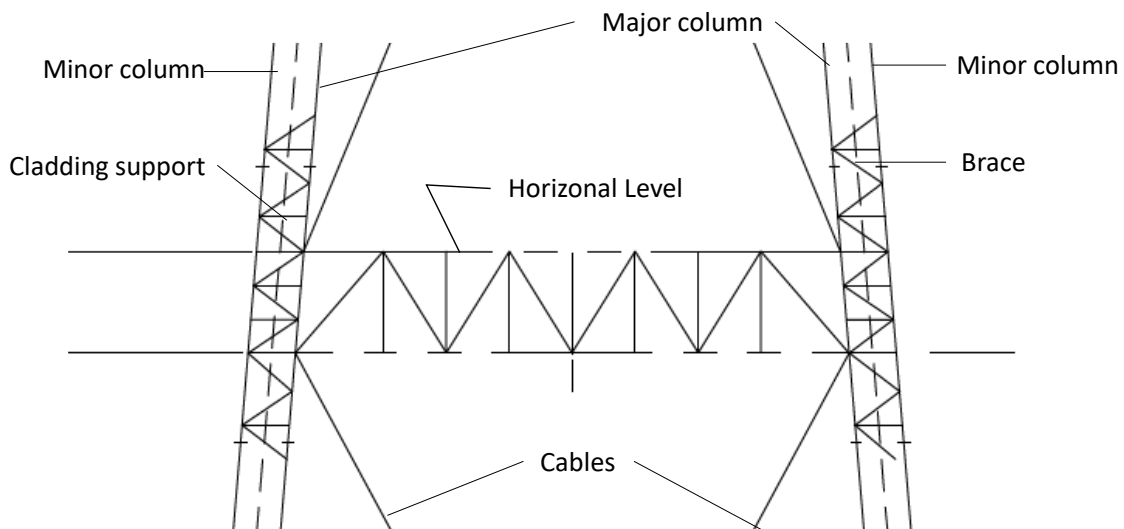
Partial Tower Elevation Showing Two Legs and One Horizontal Level
